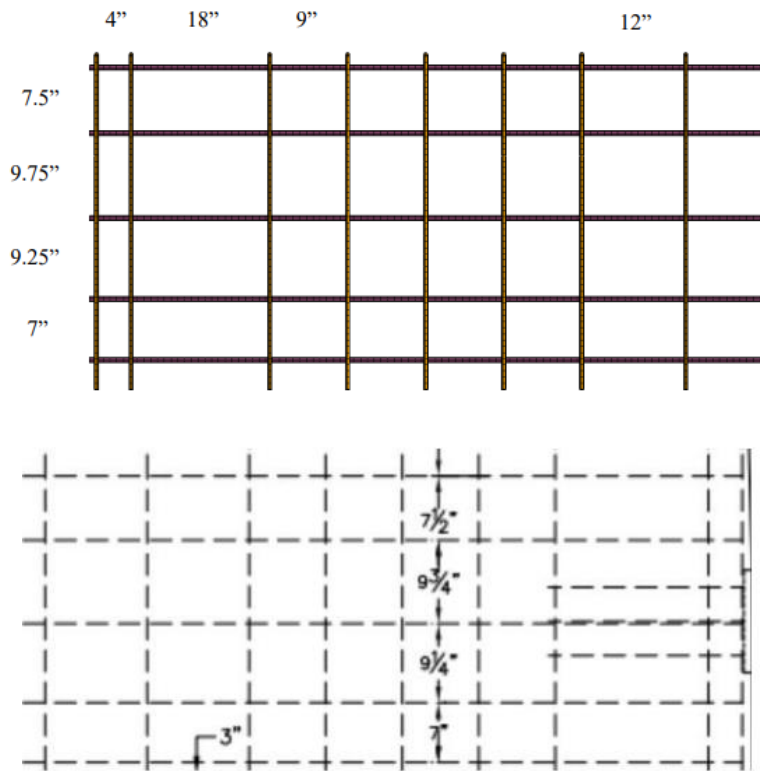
Partial Elevation of the Reinforcement Cage Consisting of Longitudinal Rebars and Stirrups
